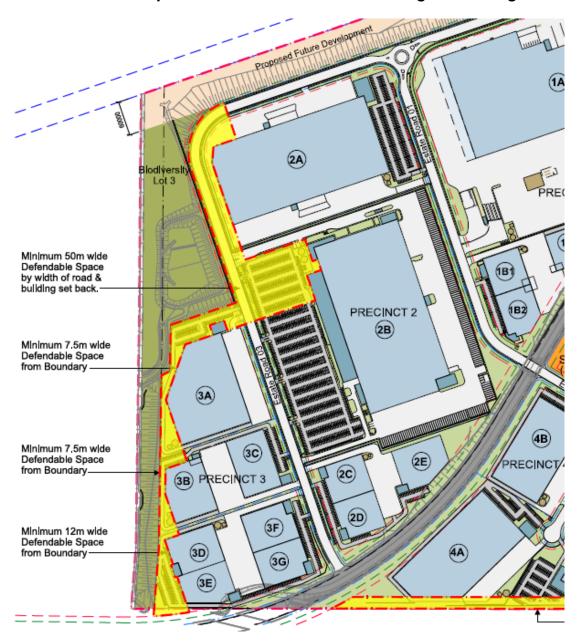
Site Plan for the proposed Warehouse Building on Site 2B within the Stage 2 Precinct of the Oakdale West Estate.
